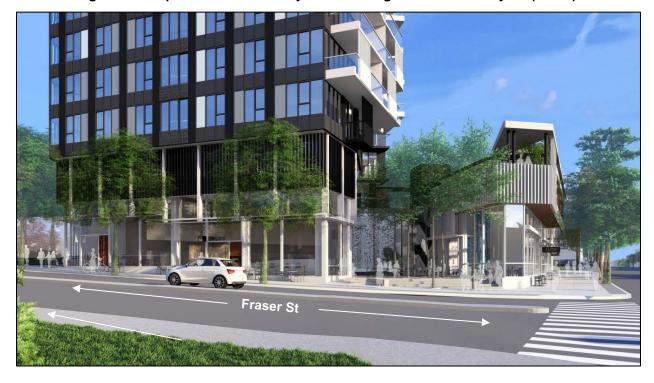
Perspective from McAuley Park Looking into Retail Courtyard (POPS)
